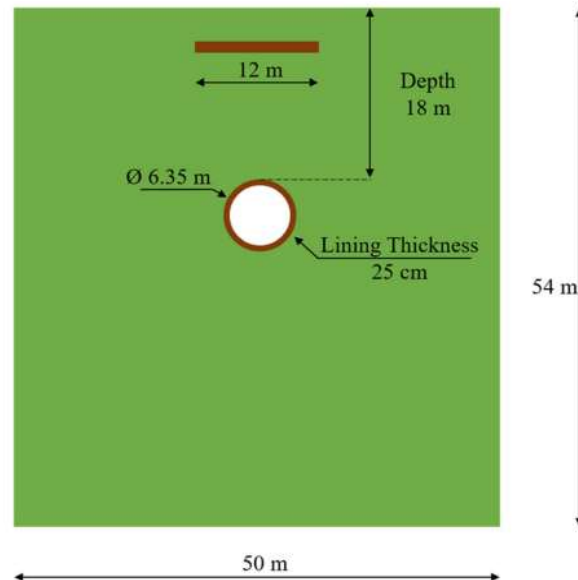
Geometry details of soil continuum and concrete tunnel lining considered for modelling
